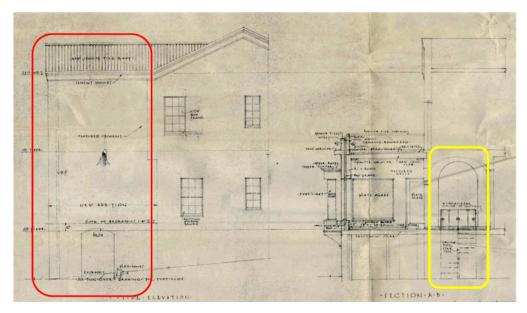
Elevation and section of the 1937 Dudley Ward scheme.
